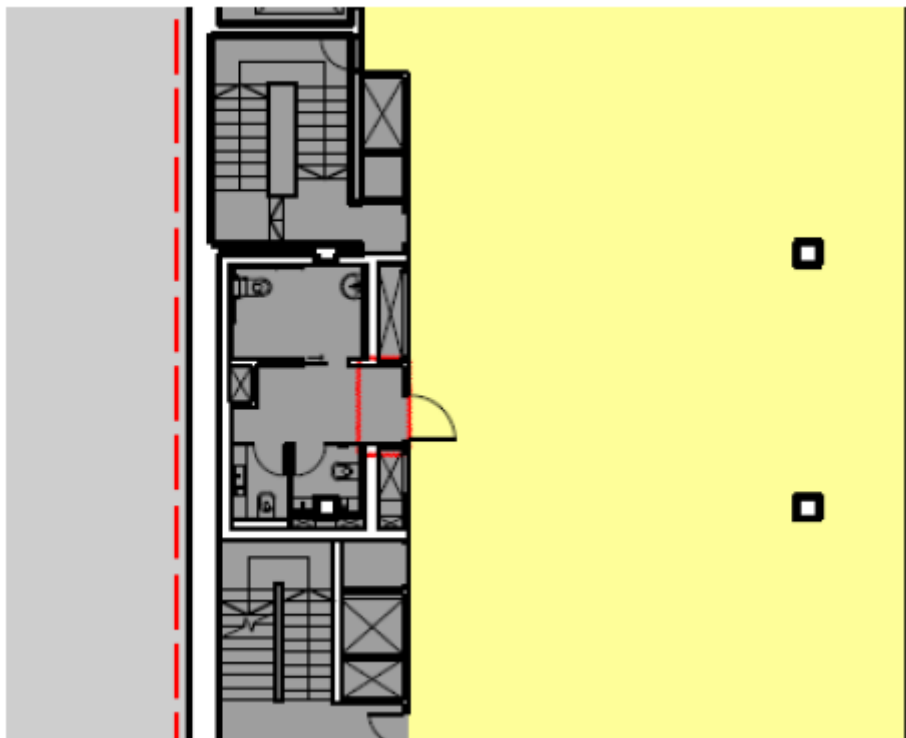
| Proposed flush wall across the Upper Ground to Office Level 3 (Source: Applicant's Modification Report)
